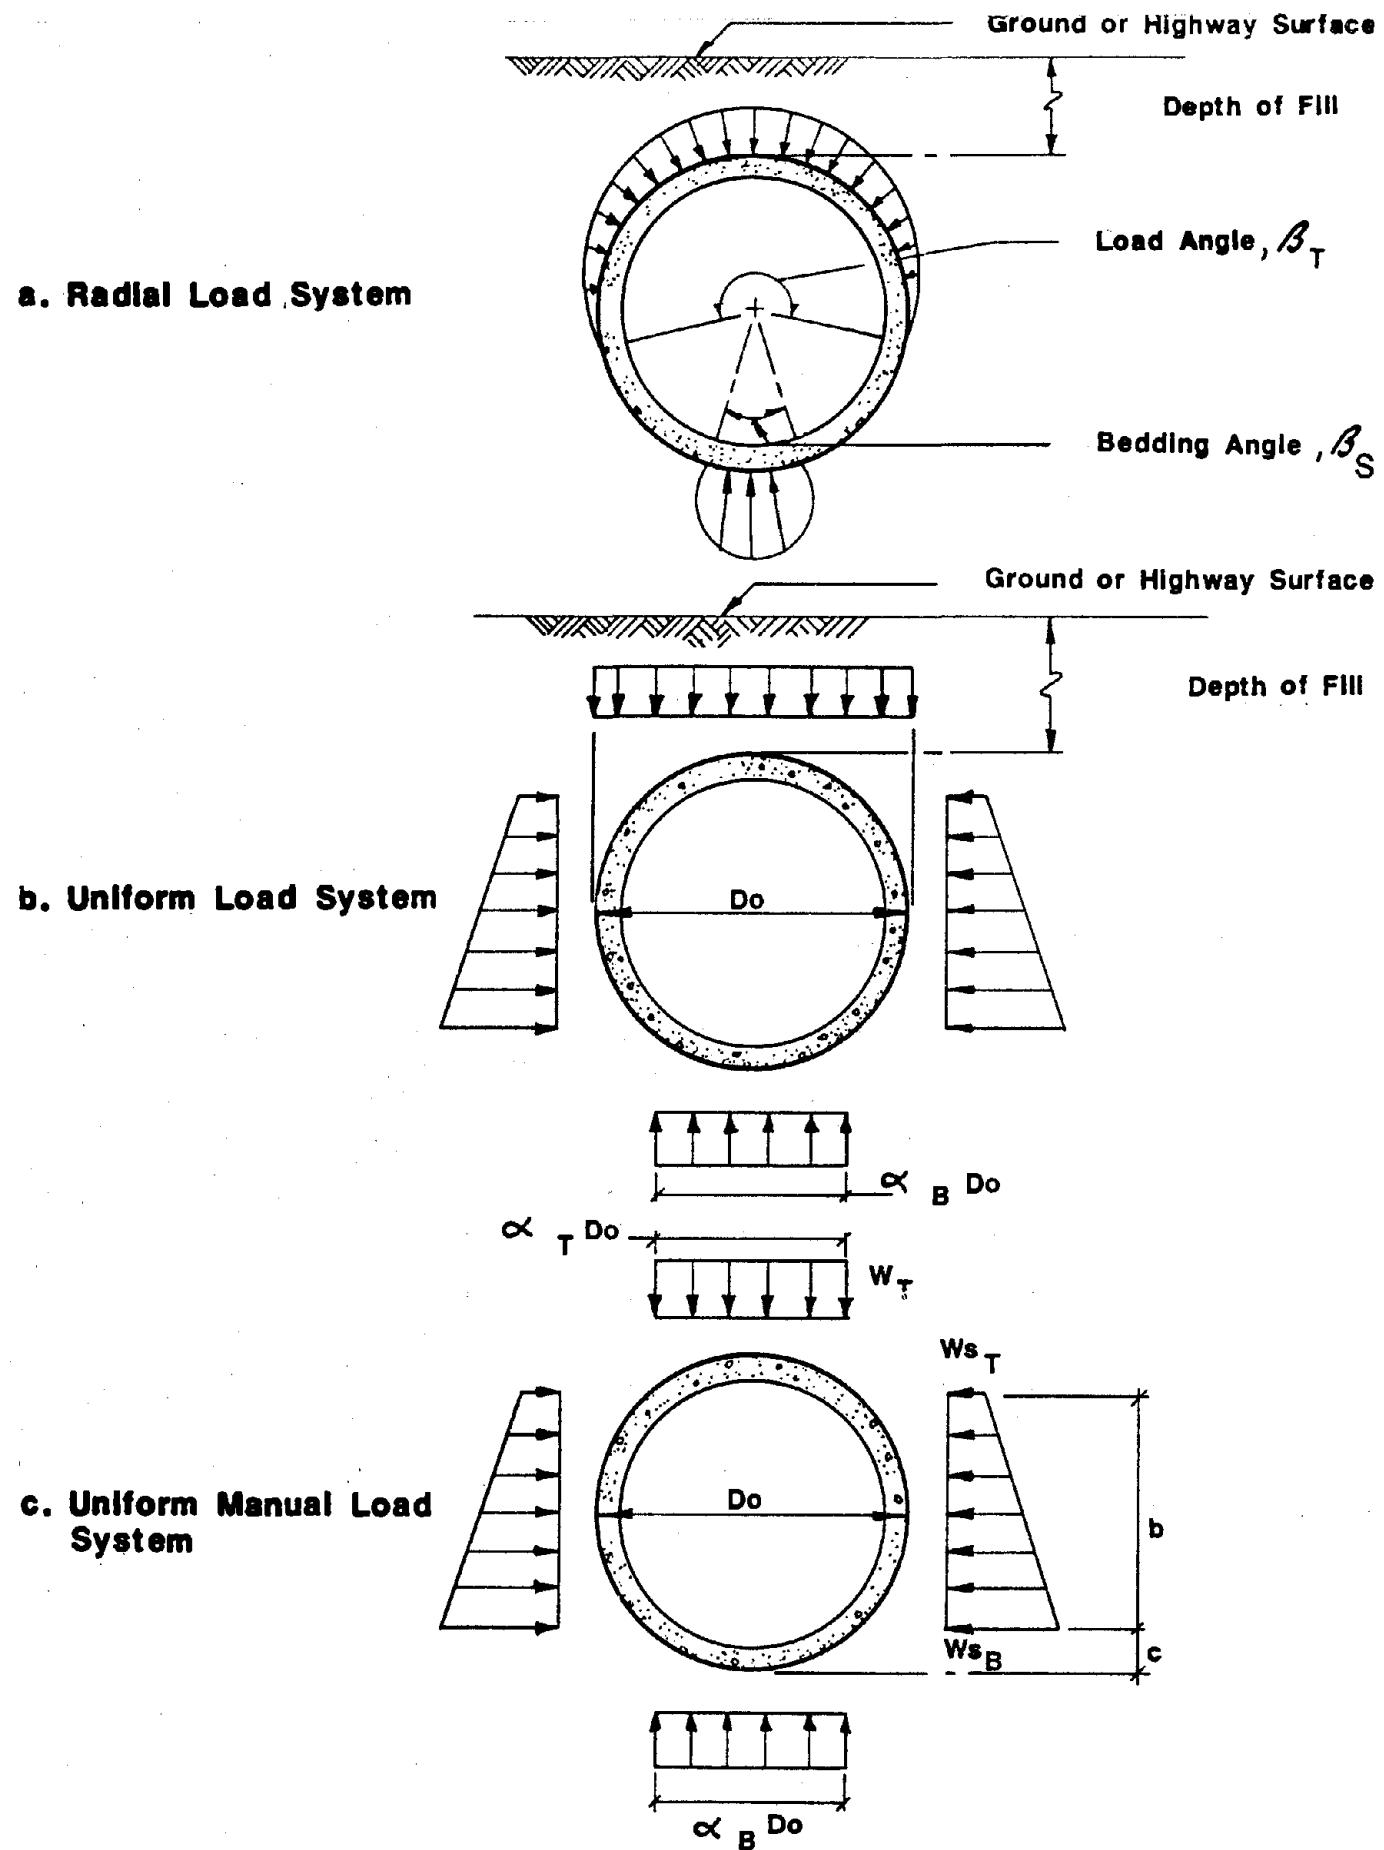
PIPE CULVERT LOAD SYSTEM NOTATION
